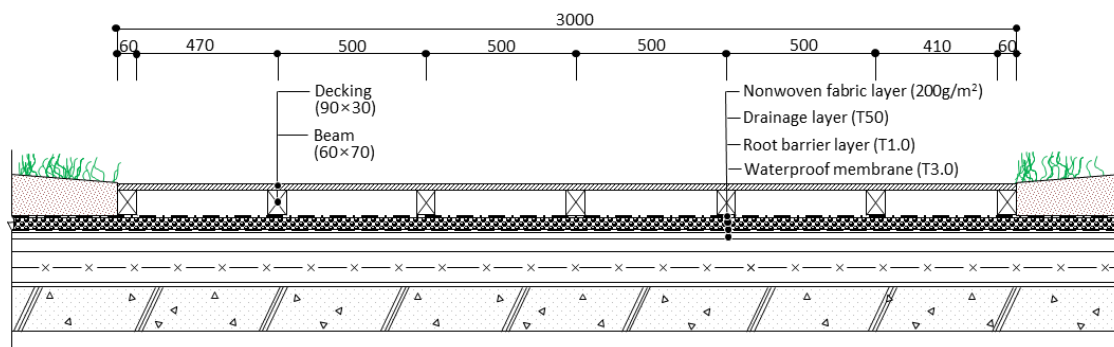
Cross-section of the wood decking (Unit: mm)
